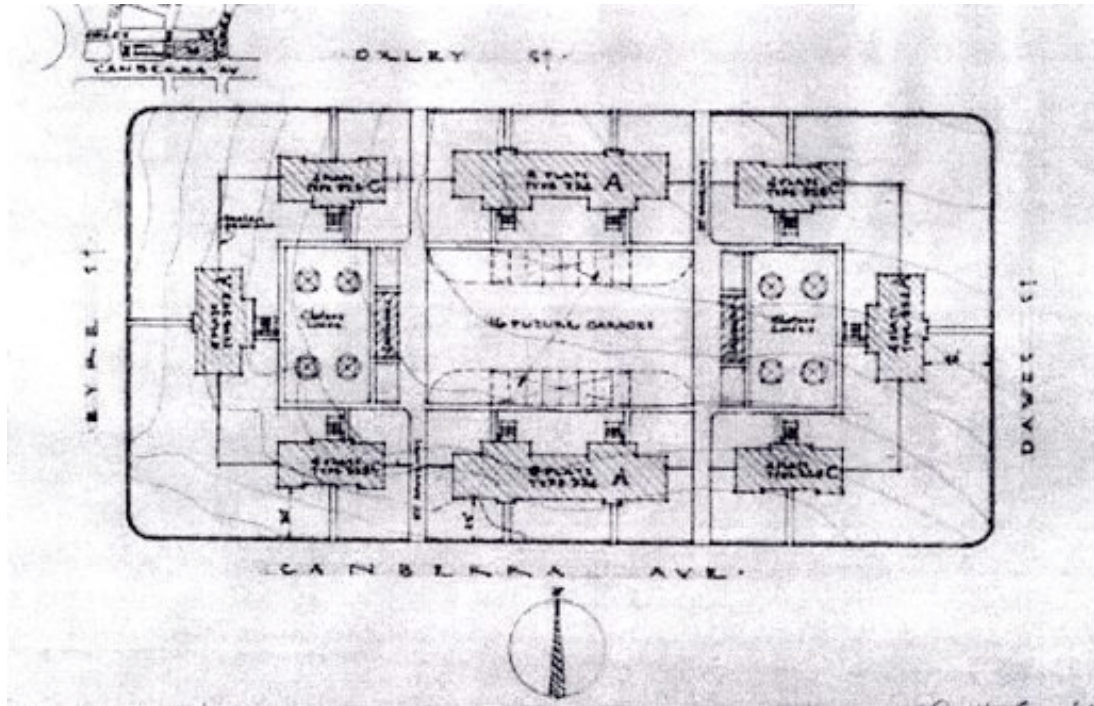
Site plan, Griffith Flats, Department of Works and Housing, Canberra, 1947. National Archives of Australia, NAA: A2617, Section 30/16983.
